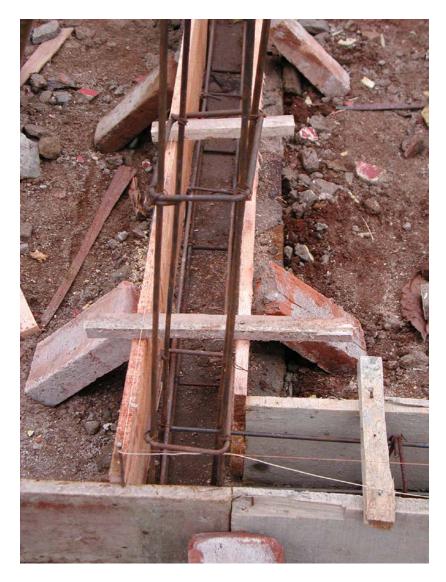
SDN Kerangi 1 showing 6mm reinforcement to office building
